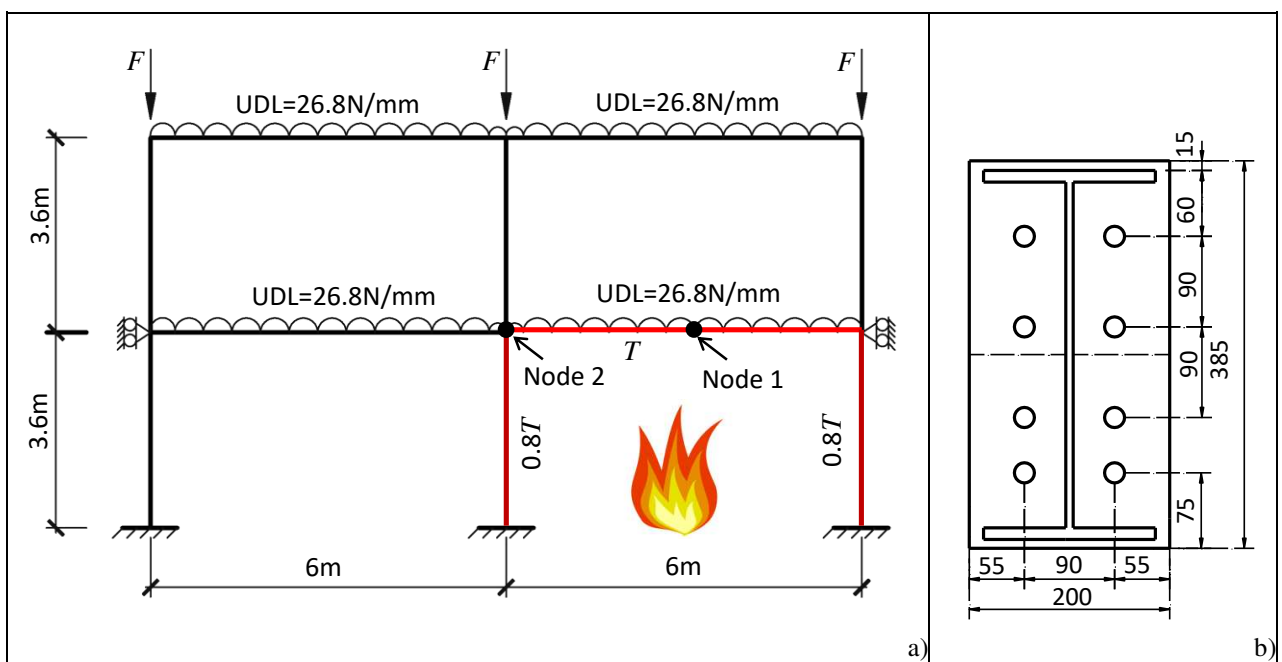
Frame analysis: a) Studied frame dimension; b) Details of the connections
